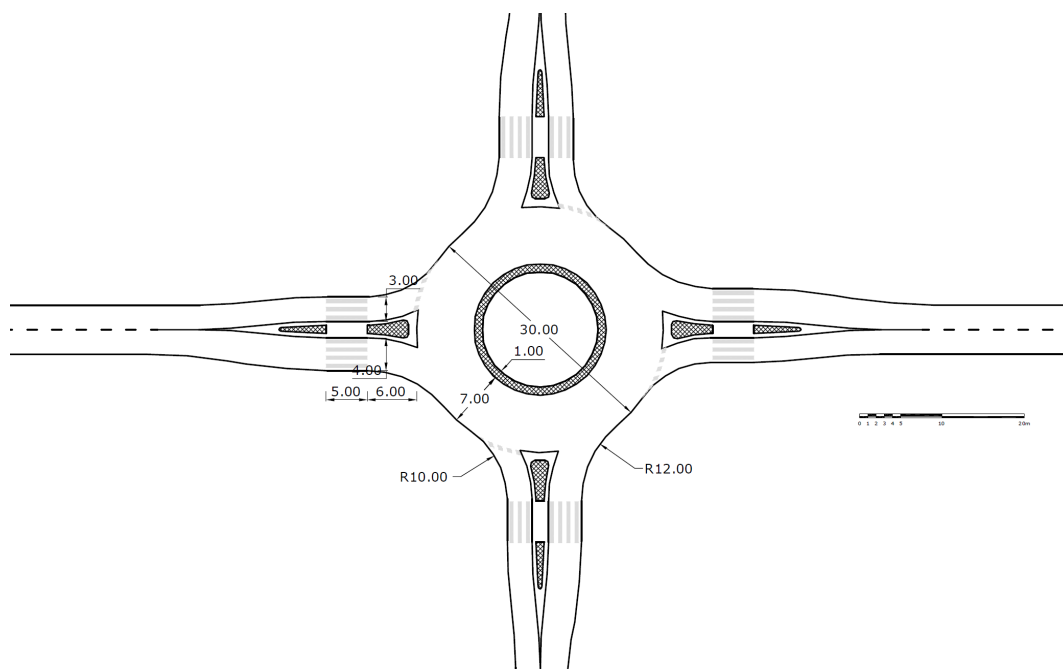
Example of a recommended compact roundabout inside built-up area.
